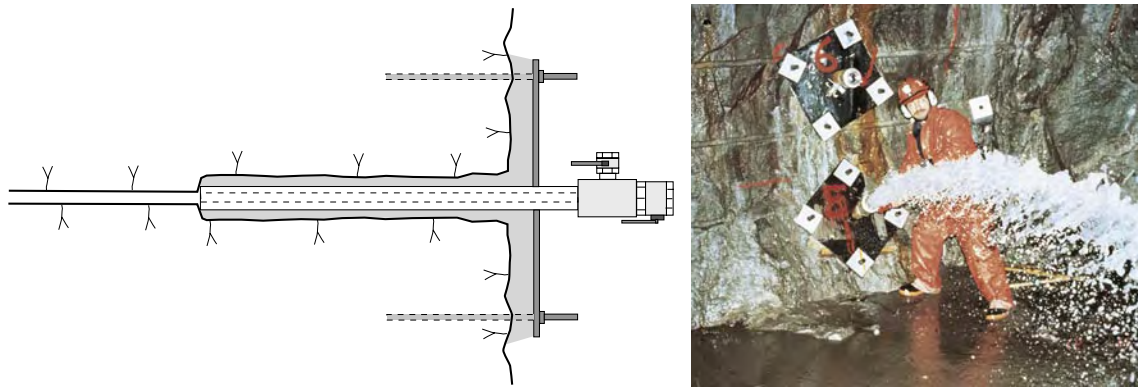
Casing arrangement for sealing of boreholes. Left: casing, sealed and anchored with grout and bolts, and valves. Right: water fountain when the valve is opened in a borehole penetrating fracture zone NE-1.
